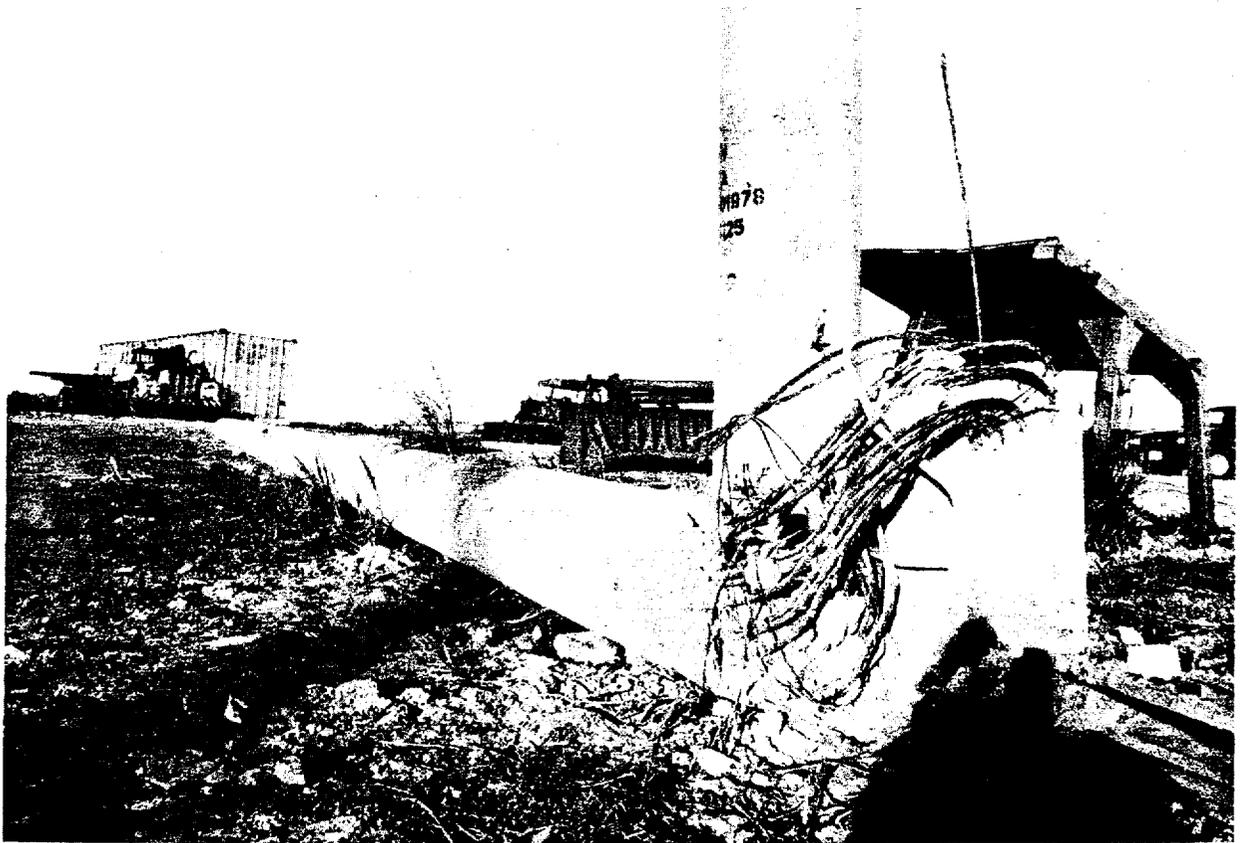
Concrete power pole on the highway north of Talofofo, Guam. The pole snapped about 5 feet above the ground and fell across the road. It was later pushed out of the road to enable traffic to pass. (Photo courtesy of Det 1, 1 Weather Wing/1Lt Joe Hanser)
